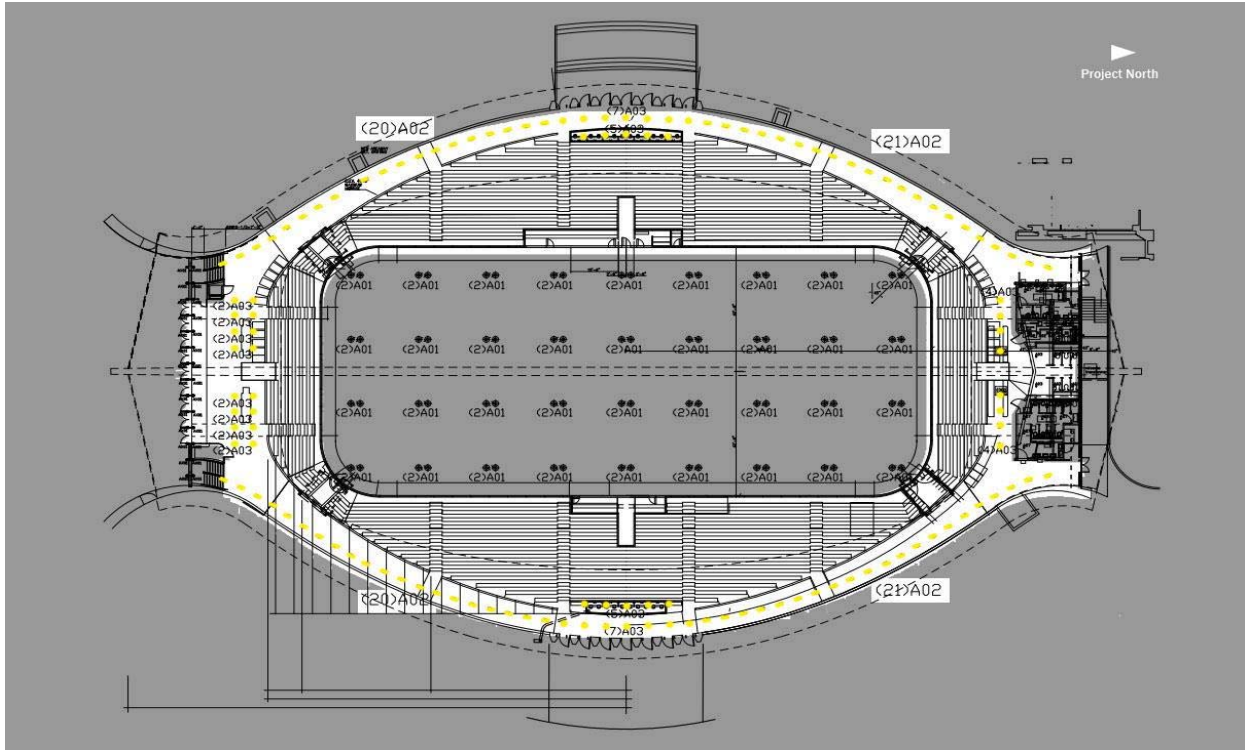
| Concourse and Seating Floor - Existing Lighting Plan
